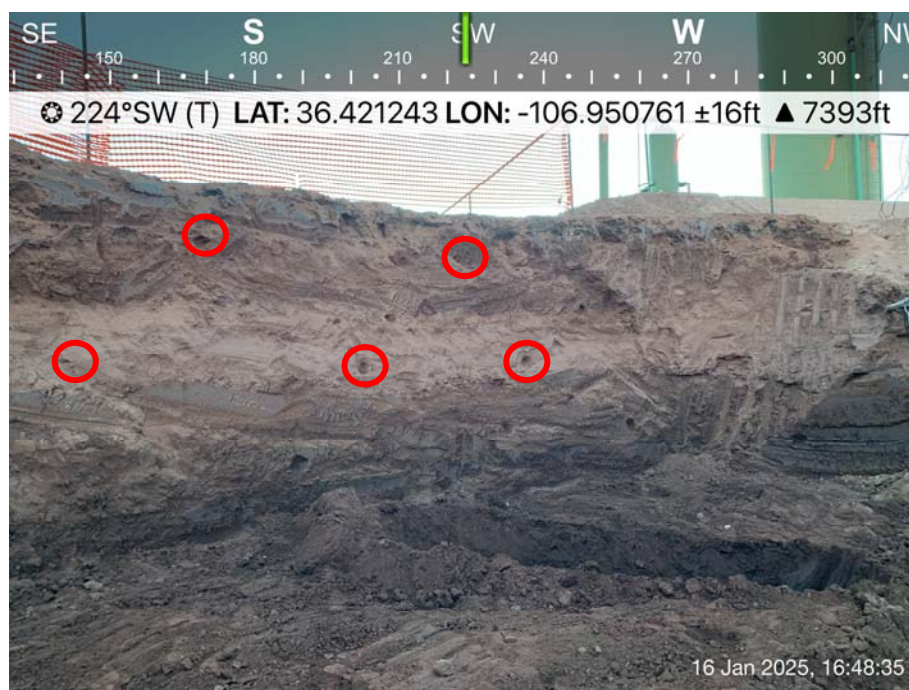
SS07 collected as a five-point composite sample 0-4 ft bgs from southwest sidewall of excavation.
